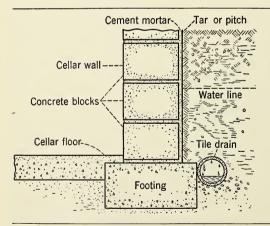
It is very important for a house to have a dry cellar. The walls and floor should be watertight, and a tile drain may be used to carry away excess water.
